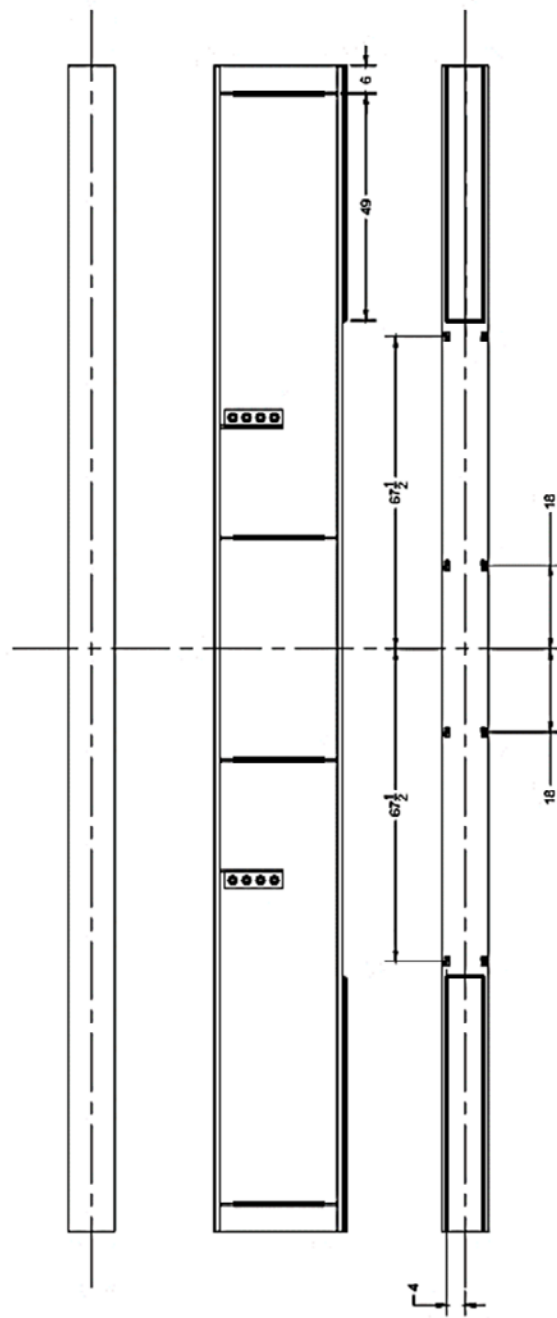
Specimen 7 – 14 Strain Gage Layout
